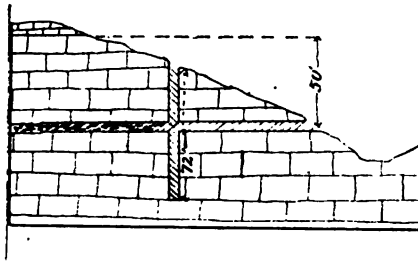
Section at the Pilot Rock shaft and tunnel.
